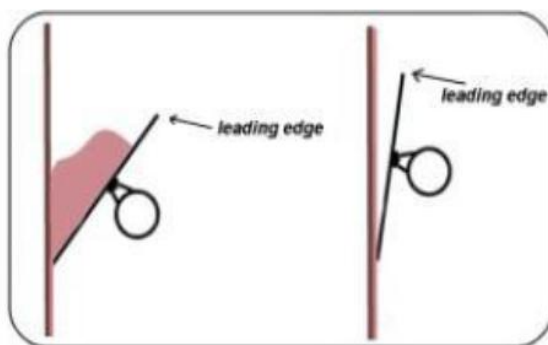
shows the trowel operation technique in ancient covering technique. The right covering technique is crucial with solely the trowel getting used to use and end the skim coat. Achieving a decent end is that the combination of firm pressure combined with the right angle of trowel (how so much the forefront is from the wall).
